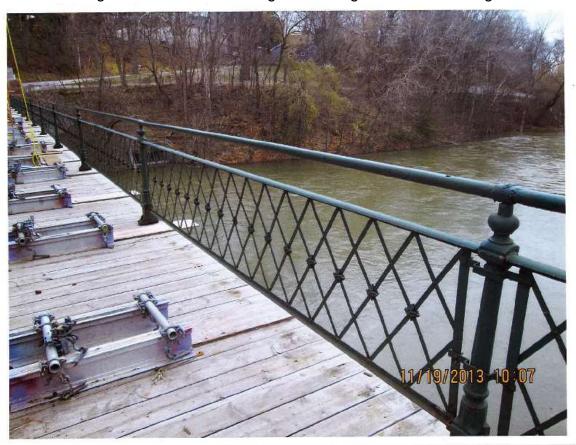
Blackfriars Bridge – Existing Pedestrian Railing
